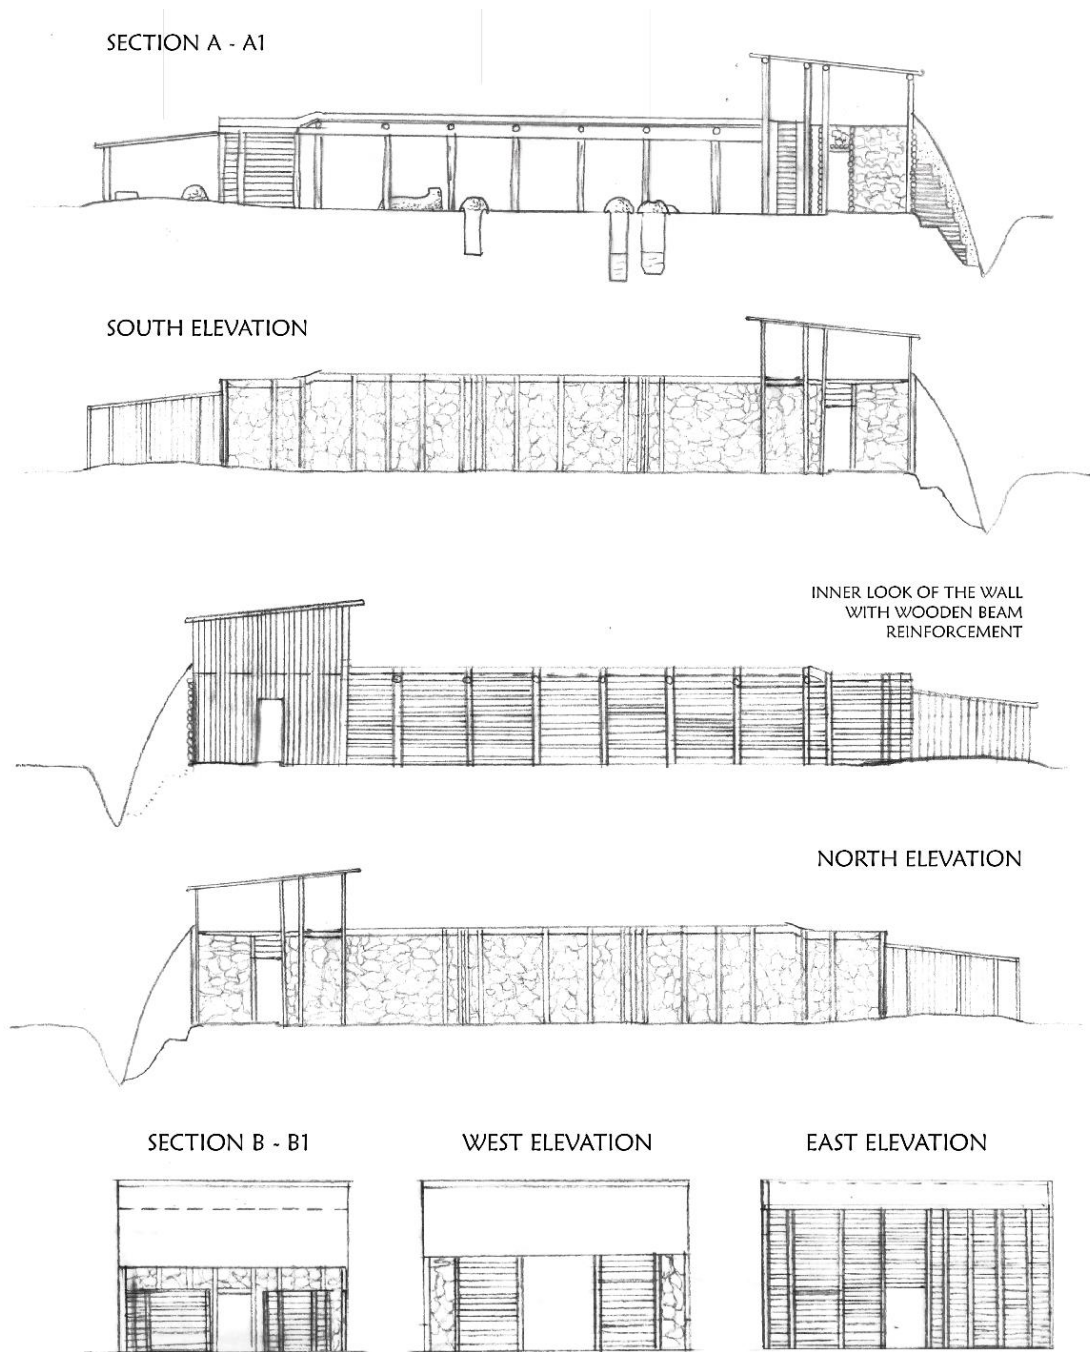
Elevations and Sections on Arkaim dwelling (Developed by Author).
